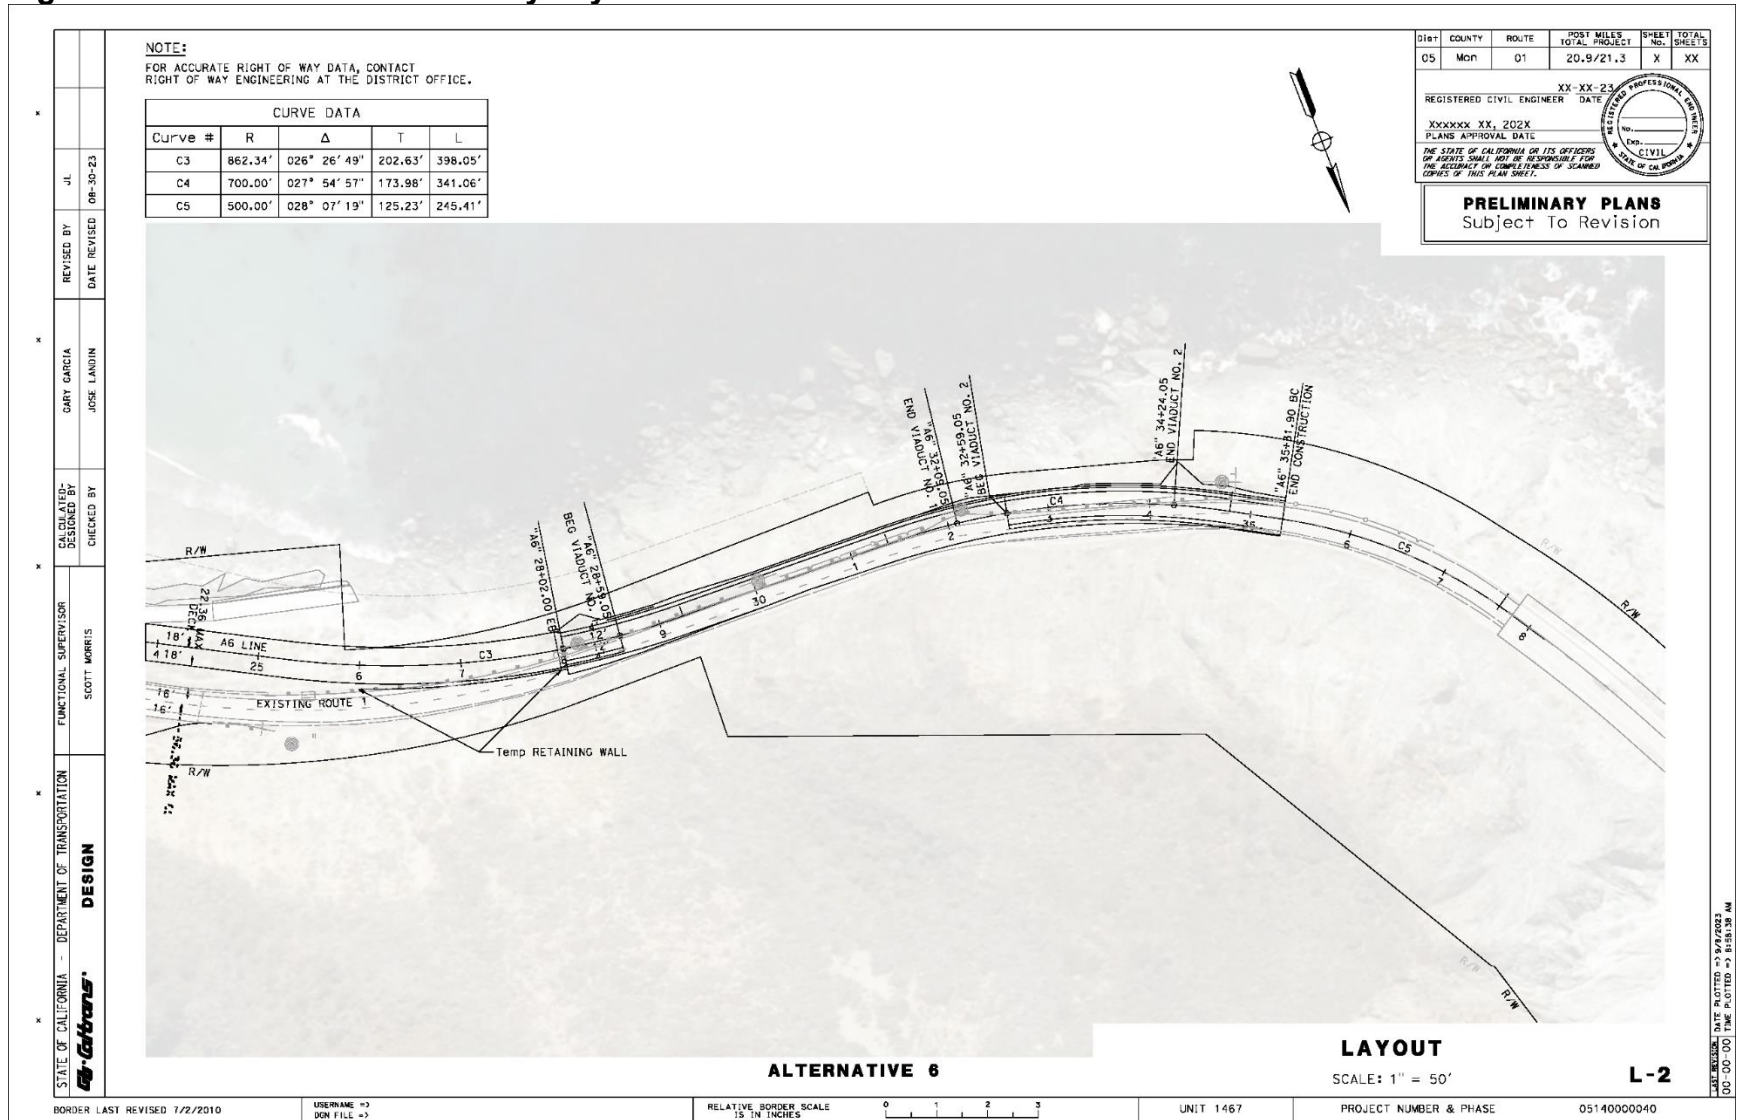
Alternative 6 Preliminary Layout Sheet 2
